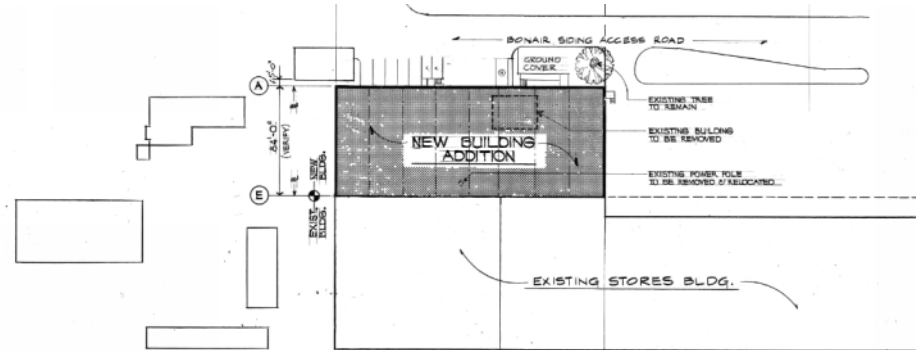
1985 site plan illustrating the northeast addition to the building at 340 Bonair Siding Road. Source: Stanford University LBRE.
